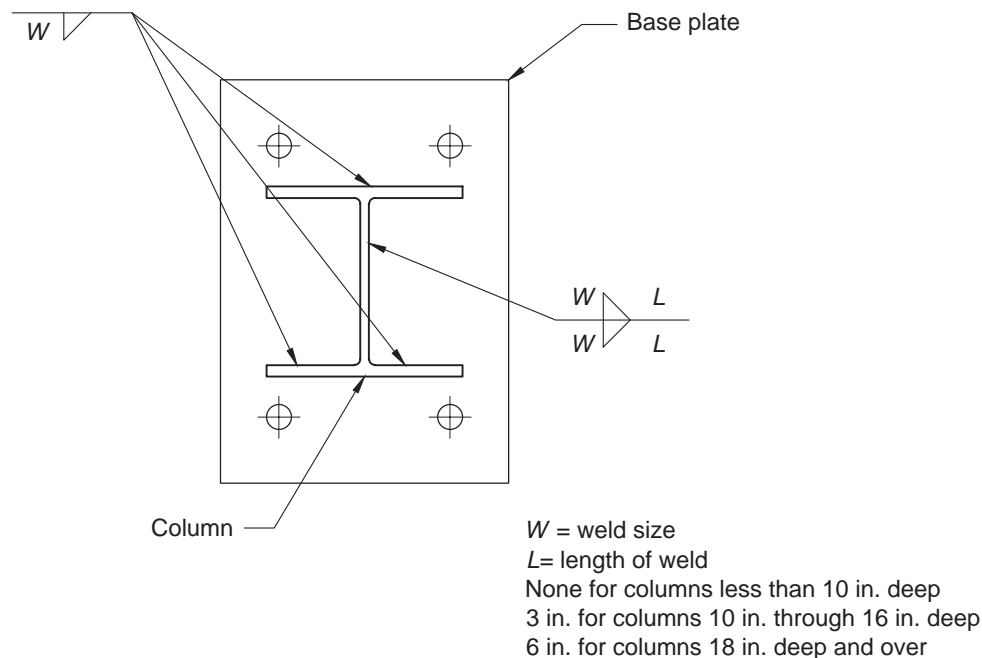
Weld pattern for column-to-base plate for axial column compression.
